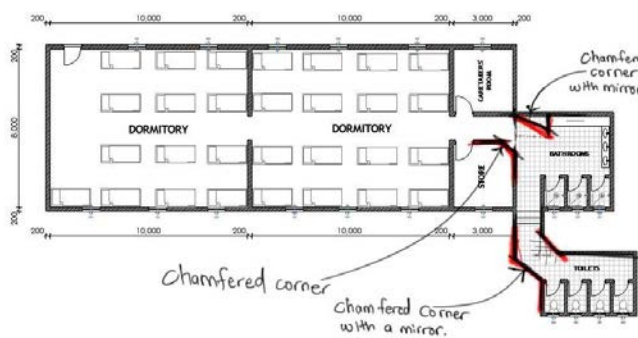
Sketch plan of the dormitory showing corners to be chamfered
